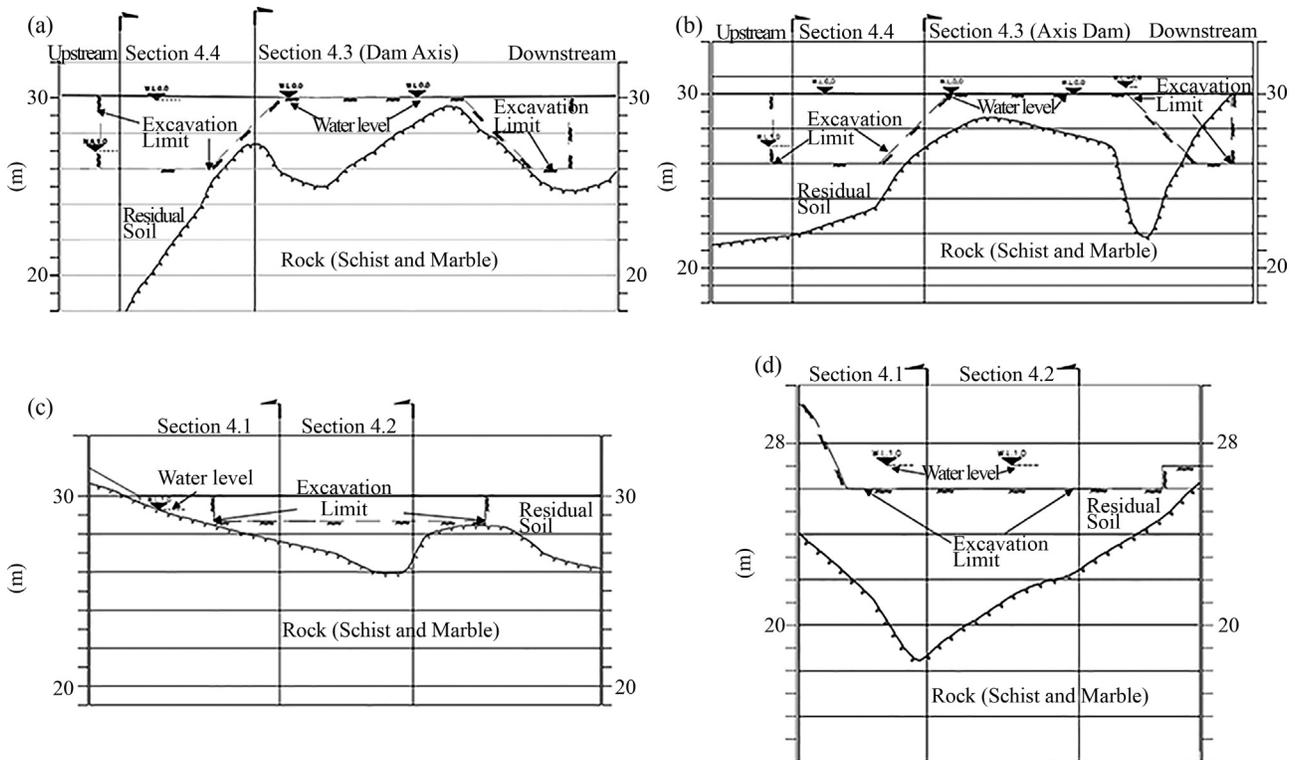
Sections 4.1 (a - study object), 4.2 (b), 4.3 (c) and 4.4 (d) of Block 4. The sections show the boundary between the estimated rocky top (altered rock) and the young residual soil of the foundation. The excavation dimensions of the foundation and the water level obtained by drilling are presented.
